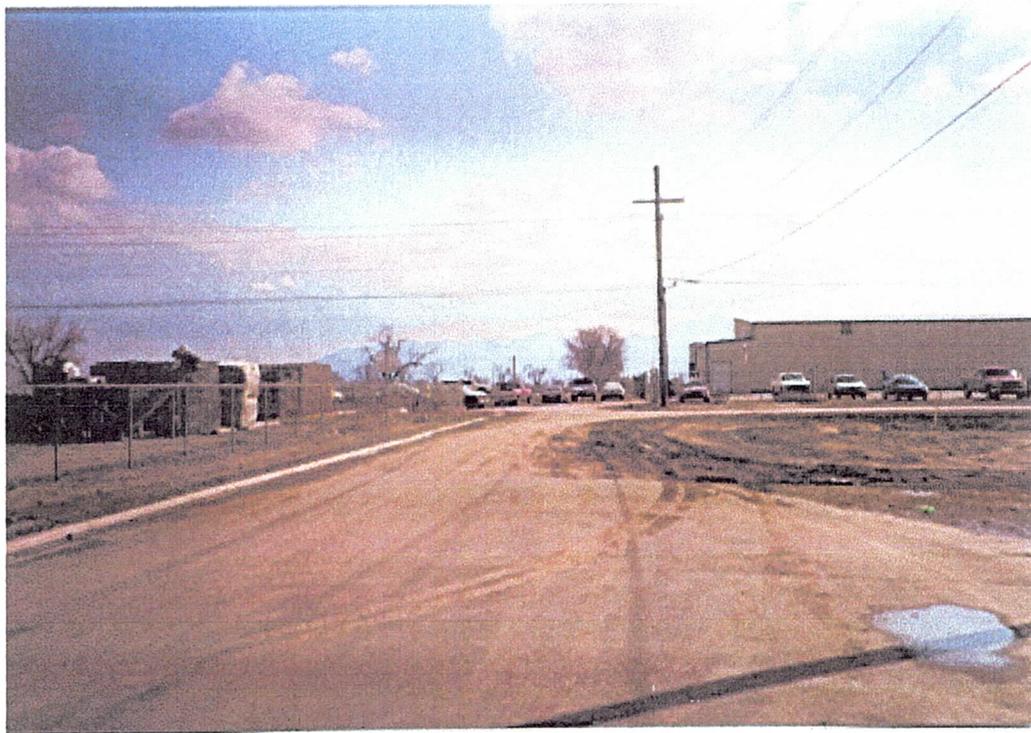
Concrete irrigation ditch along south side of Van Buren Street west of 96th Avenue (looking east).
